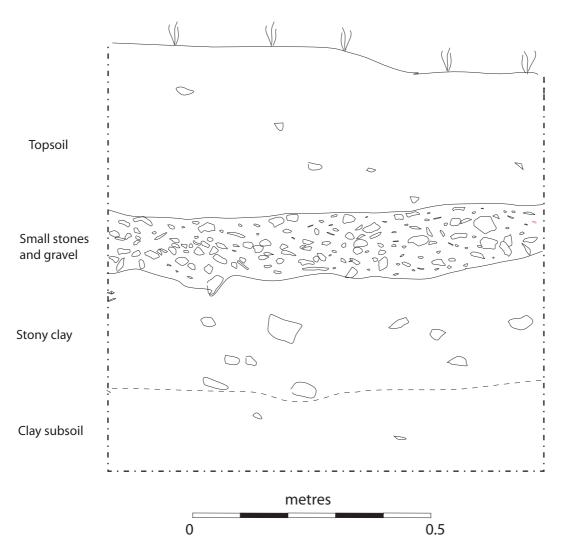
Longitudinal section through RR68 near Tomen y Mur
